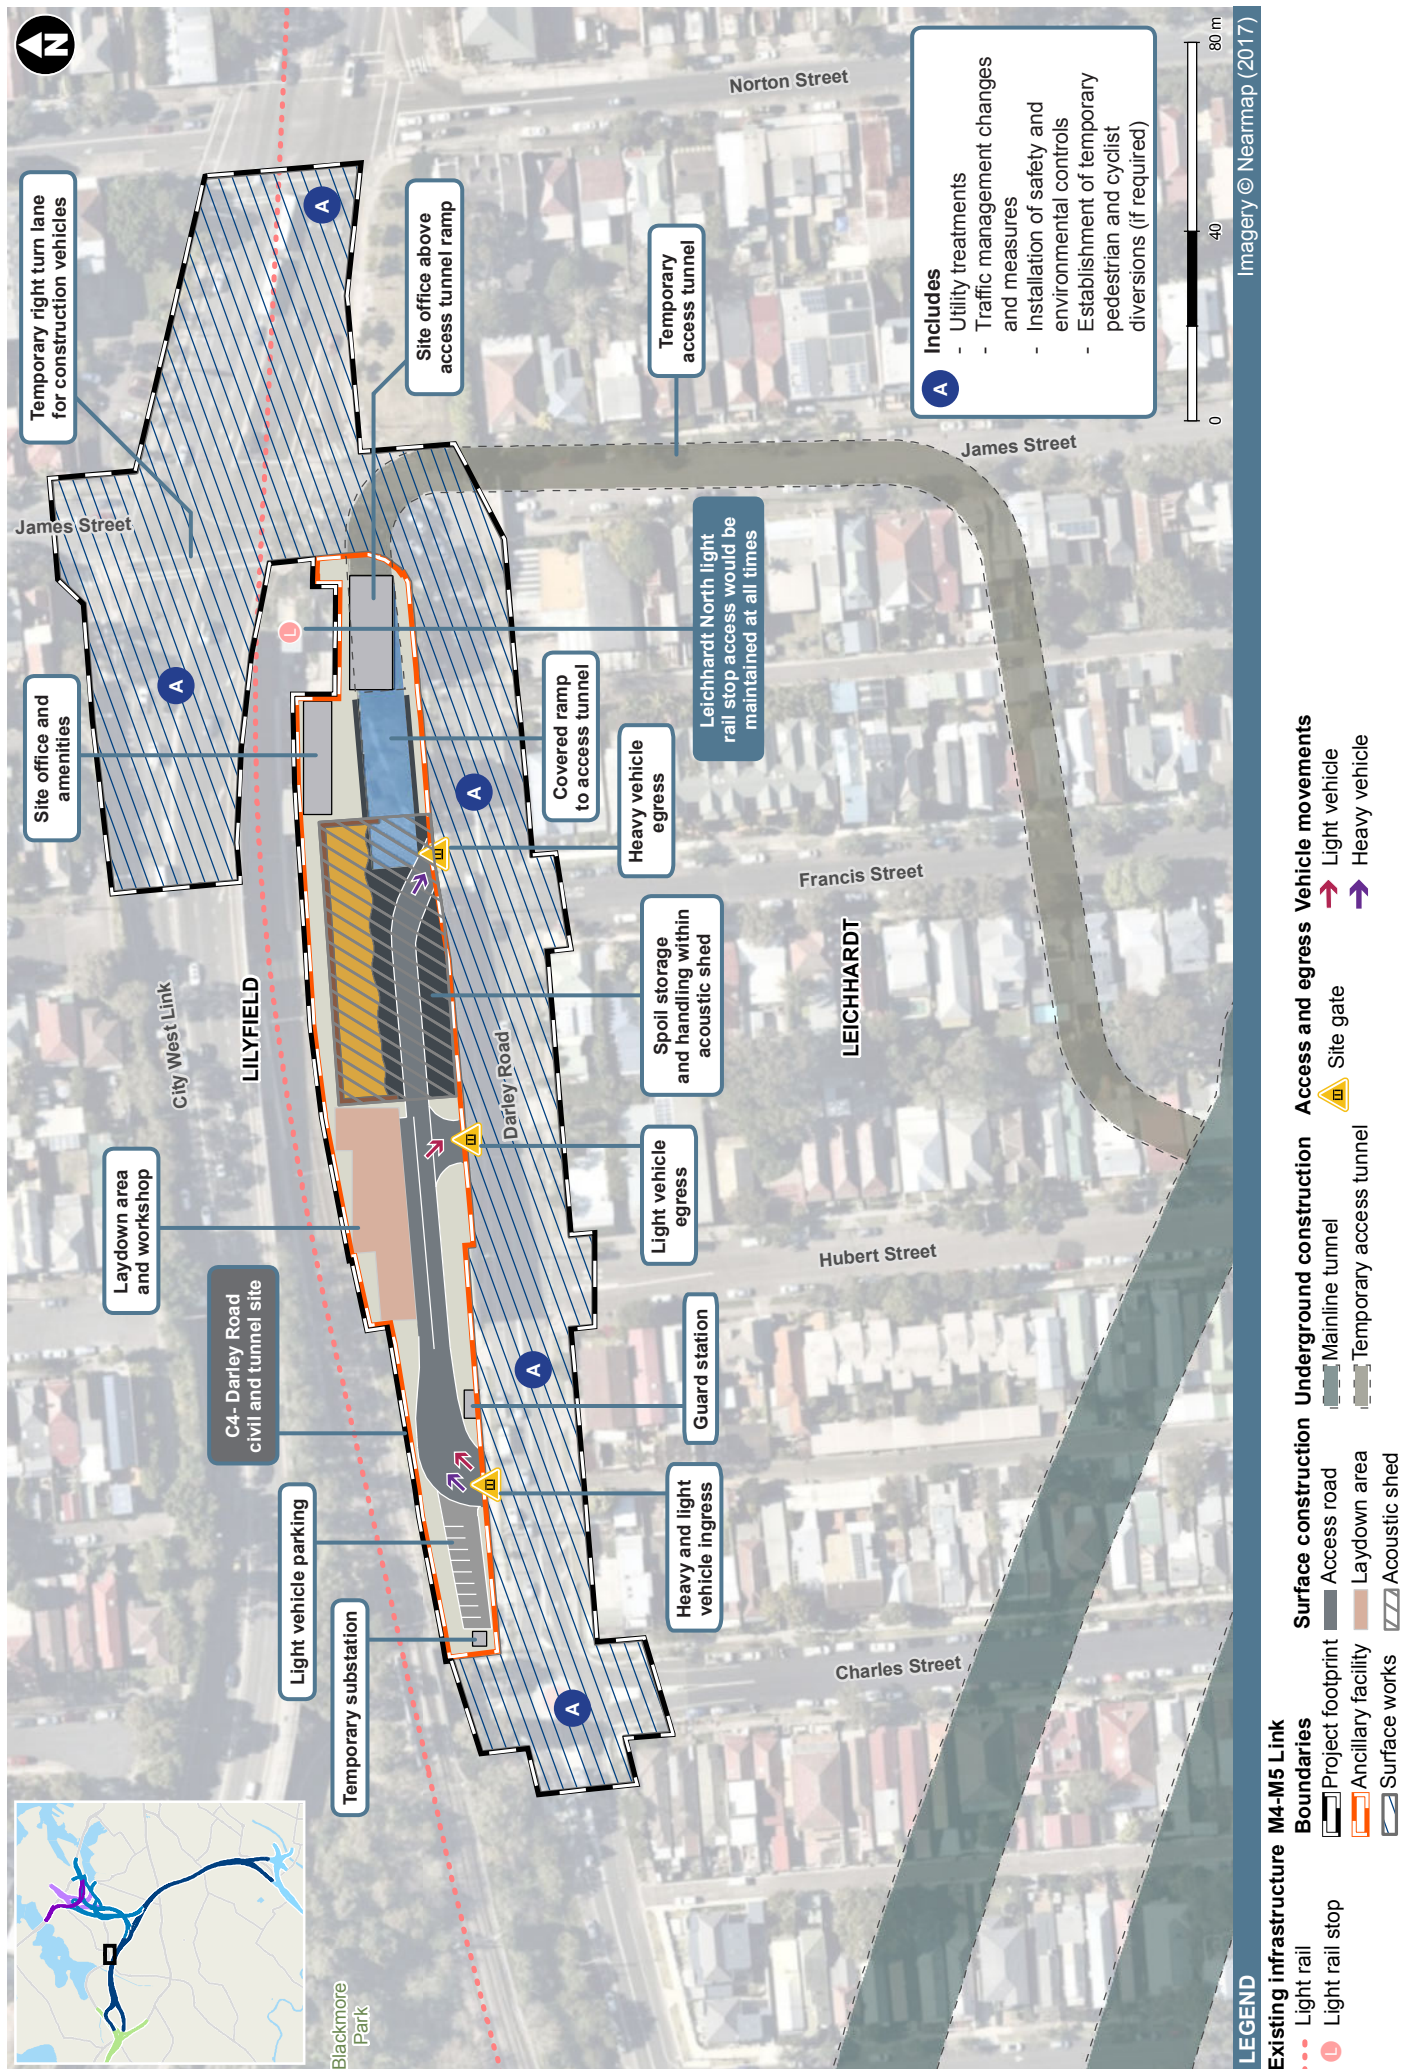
Indicative Darley Road civil and tunnel site (C4) layout
